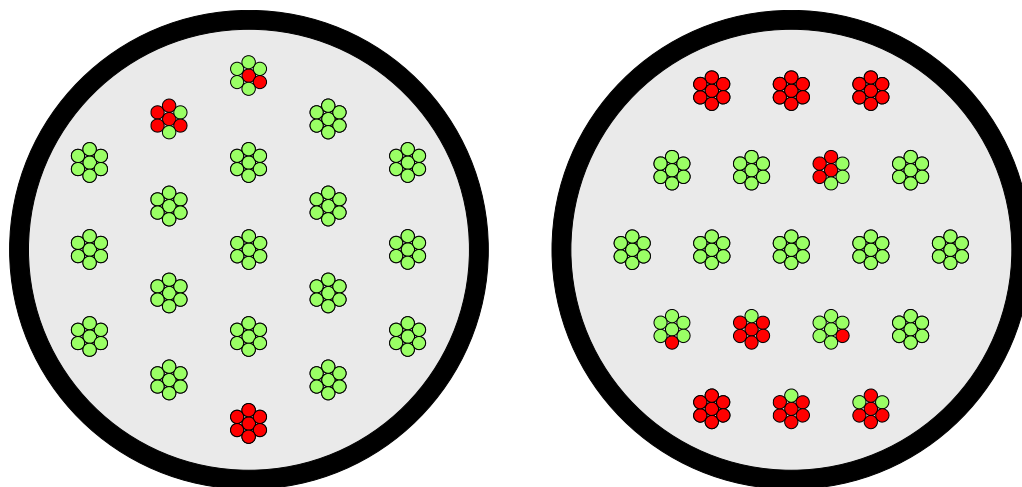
Fracture Surface – Specimen #2
